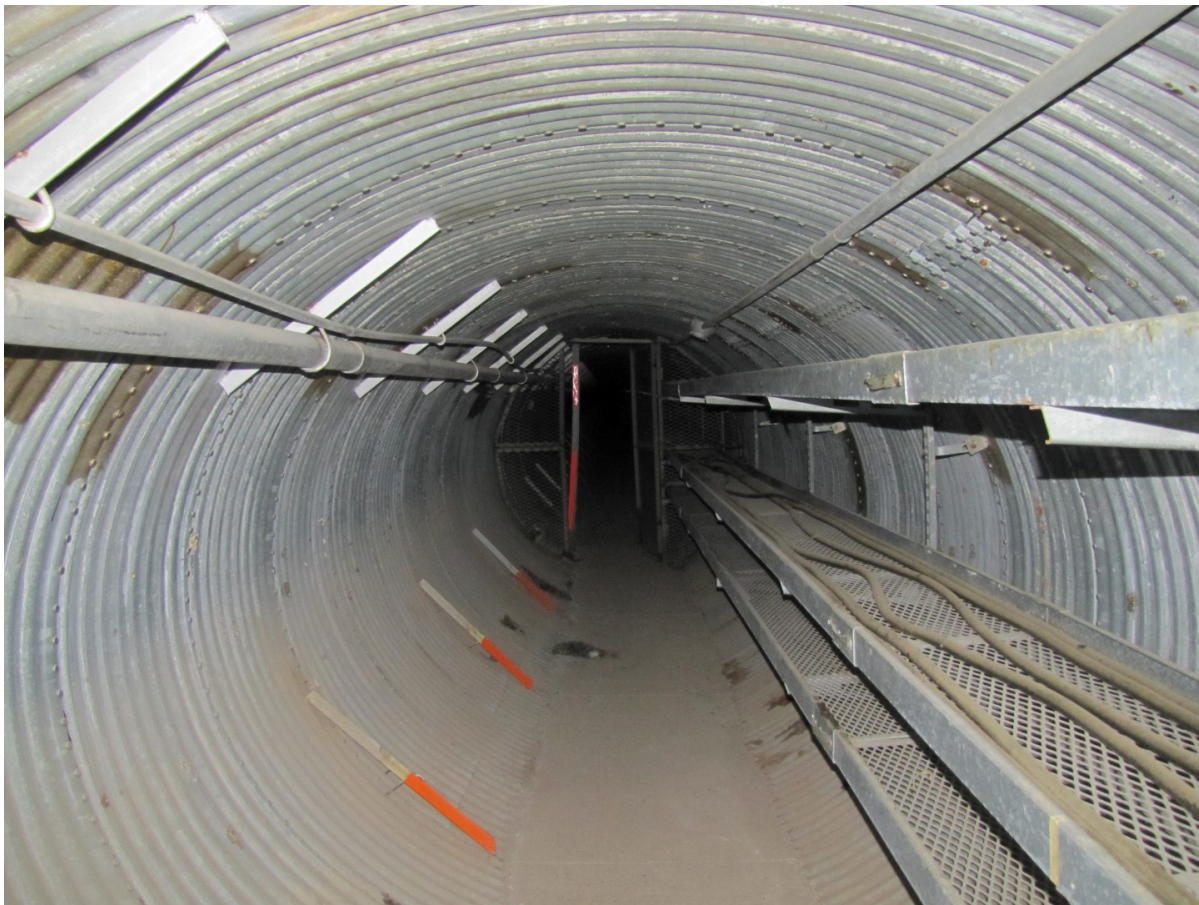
Typical section of the Nike Zeus Launch Area Tunnel.
